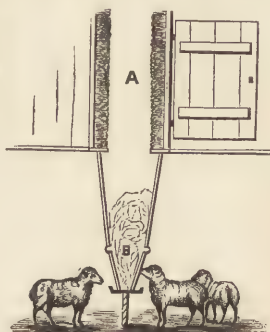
Cross-section of feeding racks, and of cut in bay above—A, cut or opening made in hay—B, double racks between appartments.
